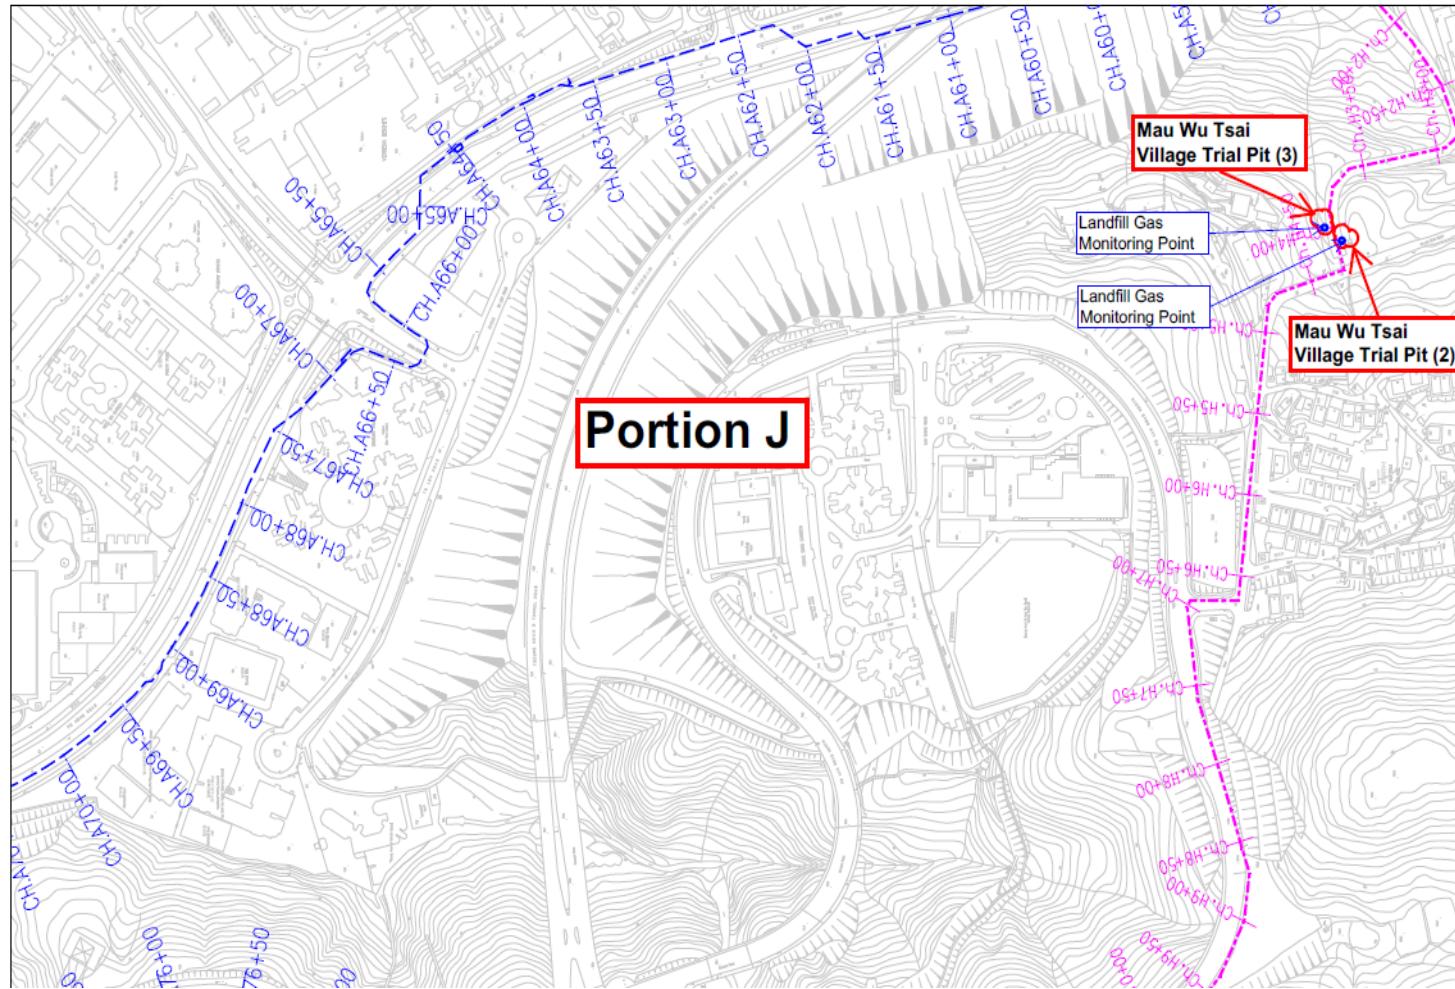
Location Plan for Portion J - Mau Wu Tsai 3 (Po Lam South Road 3)
